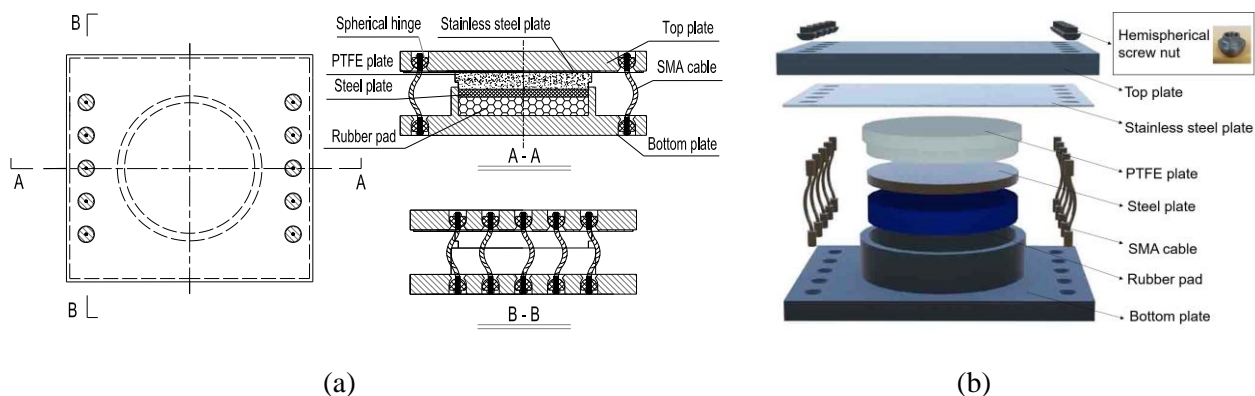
Schematic illustration of SMA-PF bearing: a) two-dimension view, b) three-dimension view
